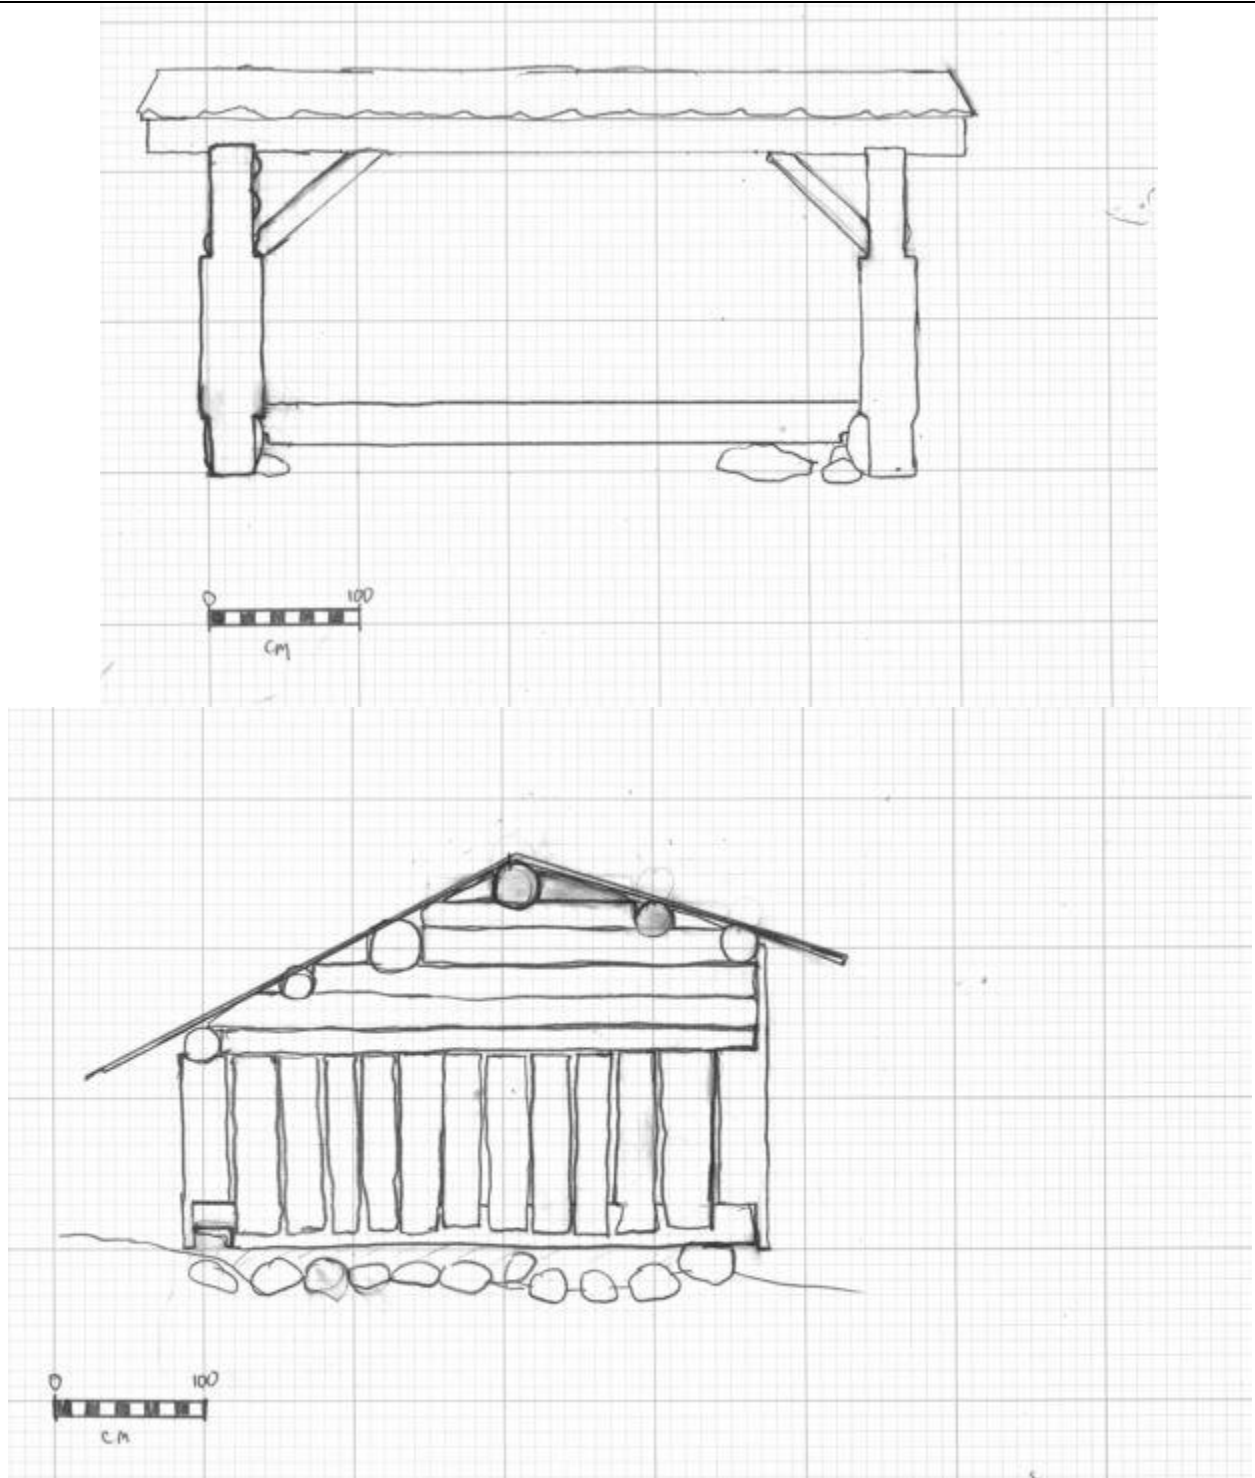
Province Pond shelter drawings. Above: South (front) elevation. Below: West side elevation. September 28, 2011.
